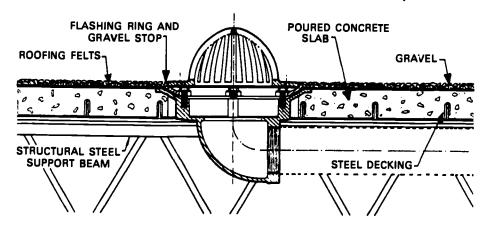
A series roof drain installed in a steel and concrete deck
